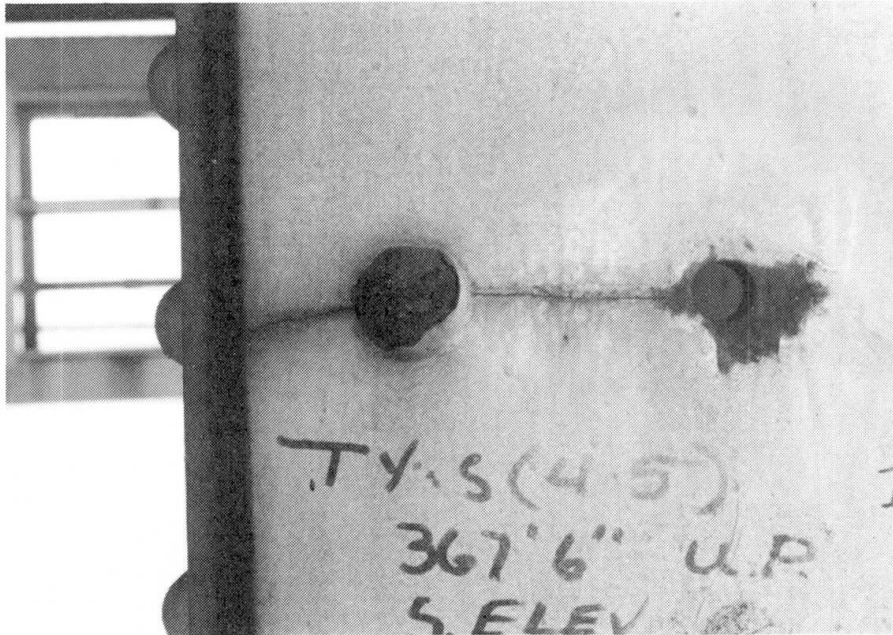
Corrosion Between a Hanger Flange Plate and Interior Connection Angle and Web Crack from Rivet Hole
